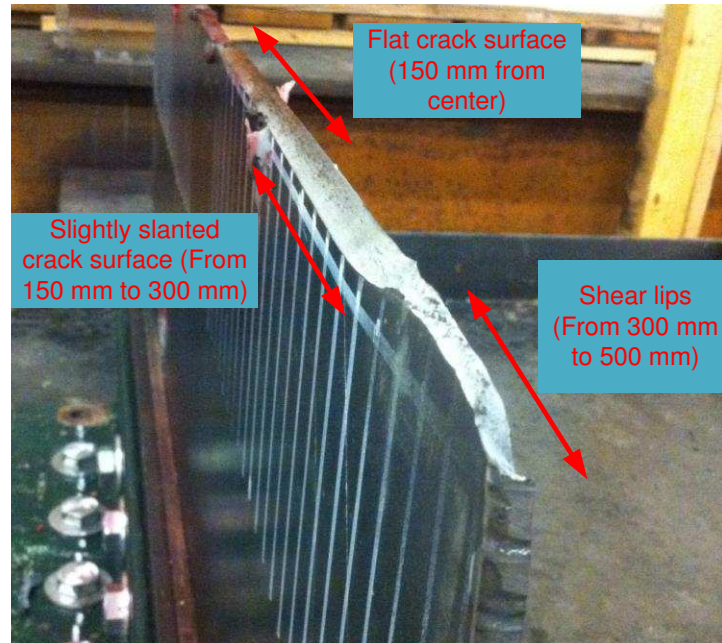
Crack surfaces for west half crack showing all the different fractures along the length of the crack after fracturing the specimen
